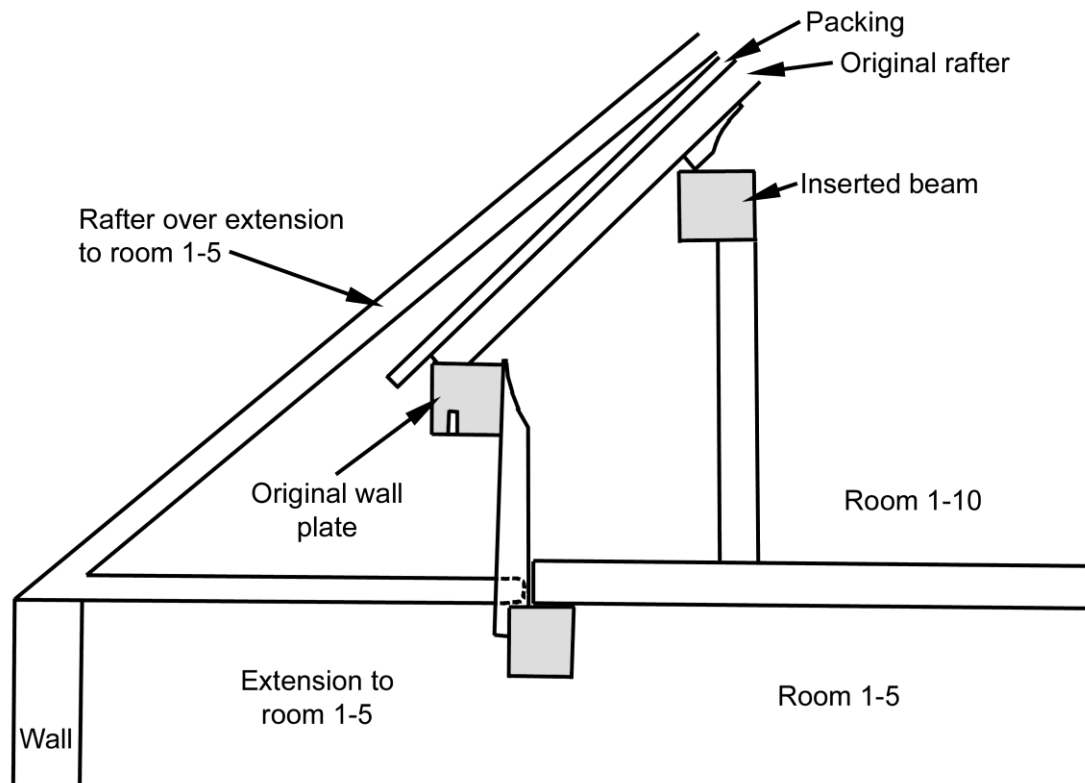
Section of the roof above the extension to room 1-5 looking south. Not to scale.
